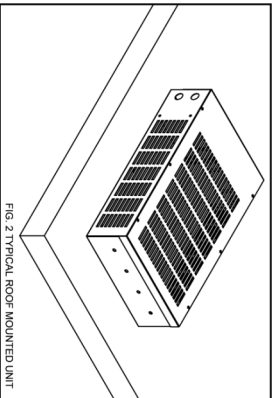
TYPICAL ROOF MOUNTED UNIT
